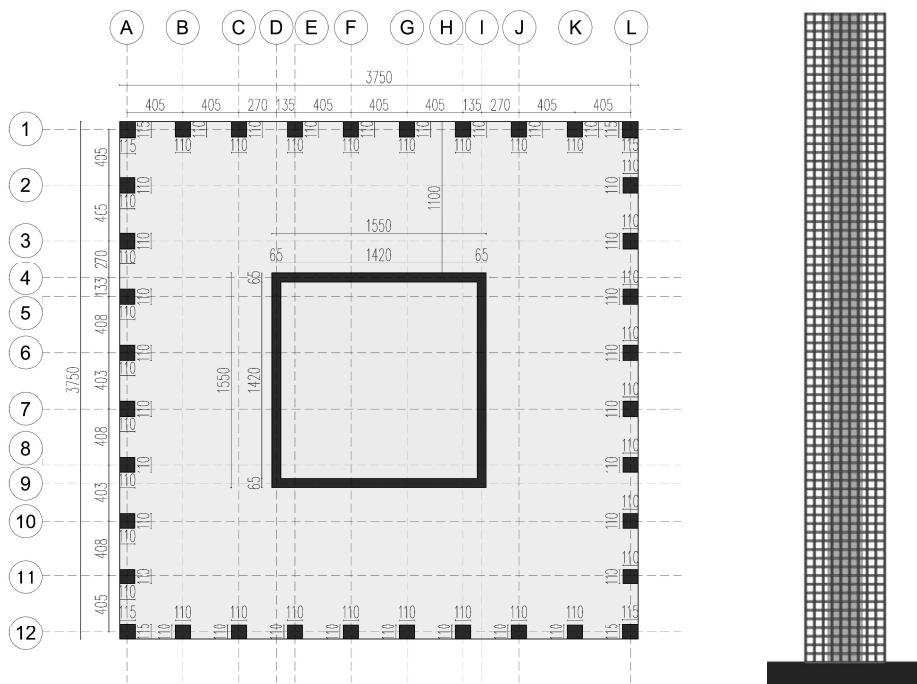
Typical floor plan and elevation of model FT_OPT_1
